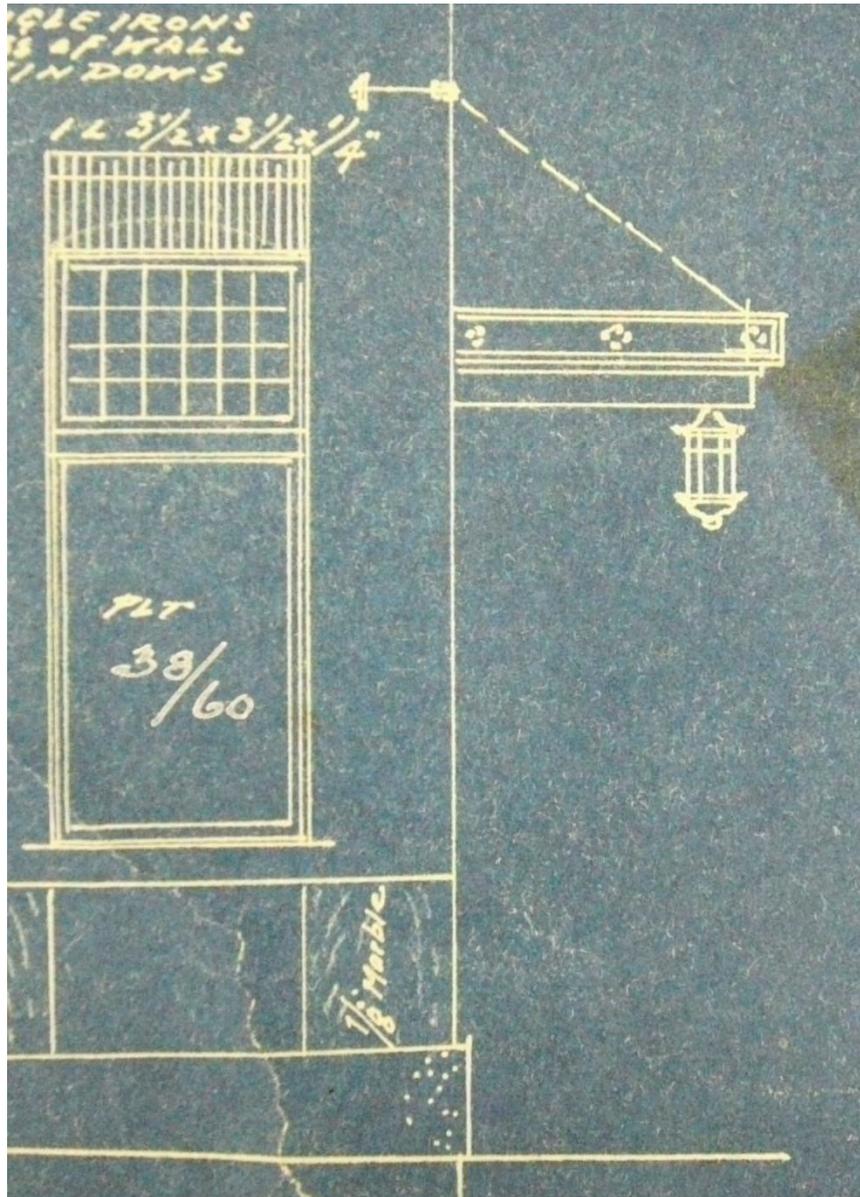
Lodge Hall entry side elevation, source: Northwest Architectural Archives
